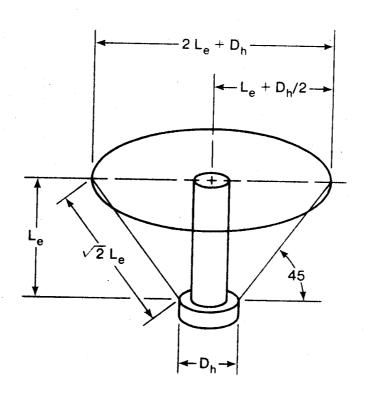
Dimensions of Stud Shear Connector and Surrounding Failure Cone
